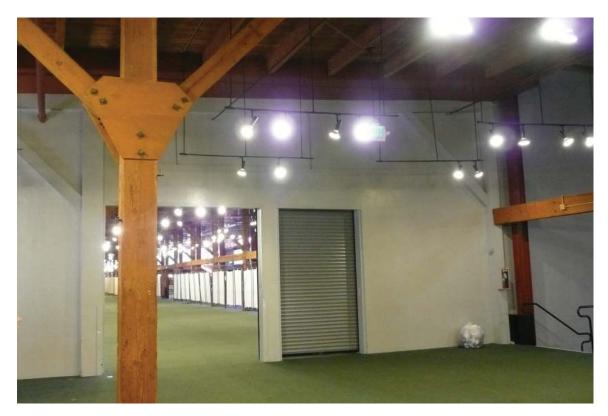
View of dividing wall in southern shed (ARG September 2009).
